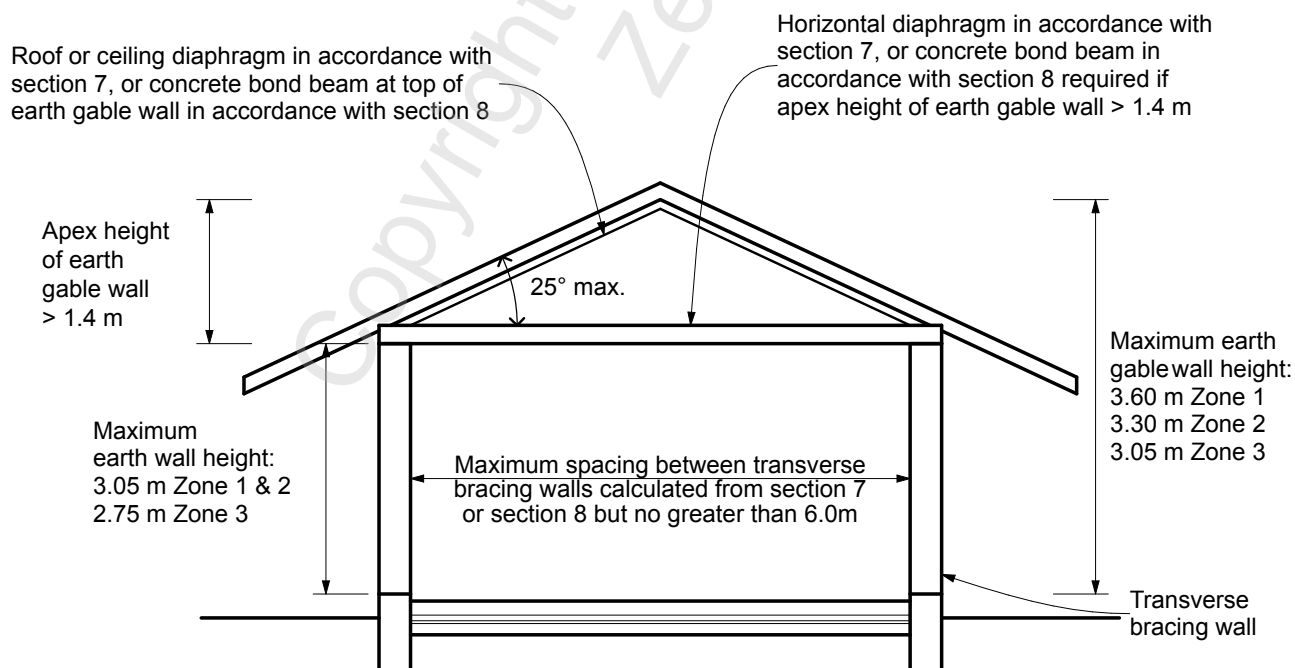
Roof or ceiling diaphragm or concrete bond beam at top of earth gable wall and horizontal diaphragm or horizontal concrete bond beam and apex gable wall < 1.4 m
